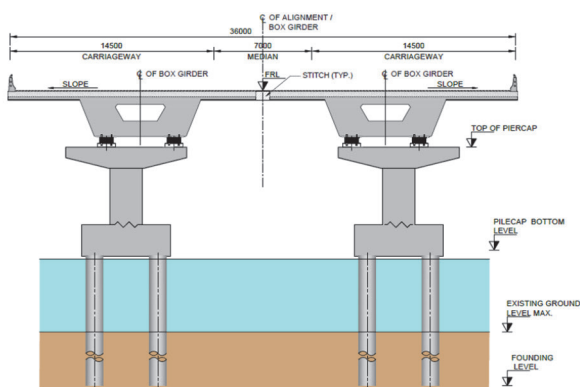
Emergency Rescue Area (Median Gap closure) with extended box girder
